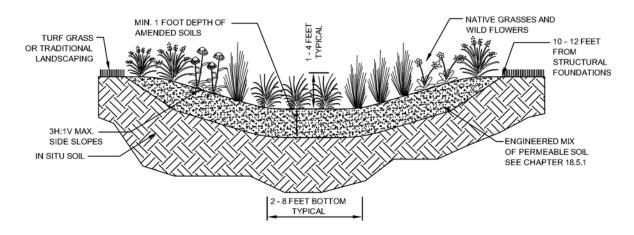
B. Soil Composition Option 2—Engineered Soils: Bioswale typical section
